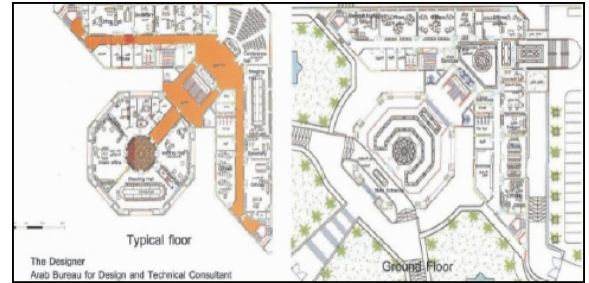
Design elements of Mashiakhah Al Azhar building on the ground and first floors
